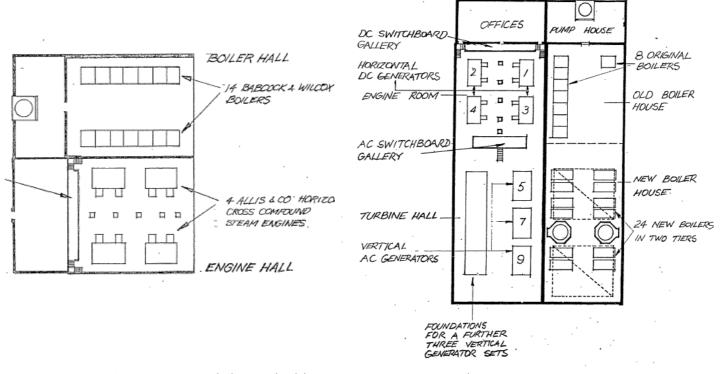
1899 Layout of the Power House layout (left) and 1902 (right). (Source: Godden et al. 1984 p. 98 and 104)
